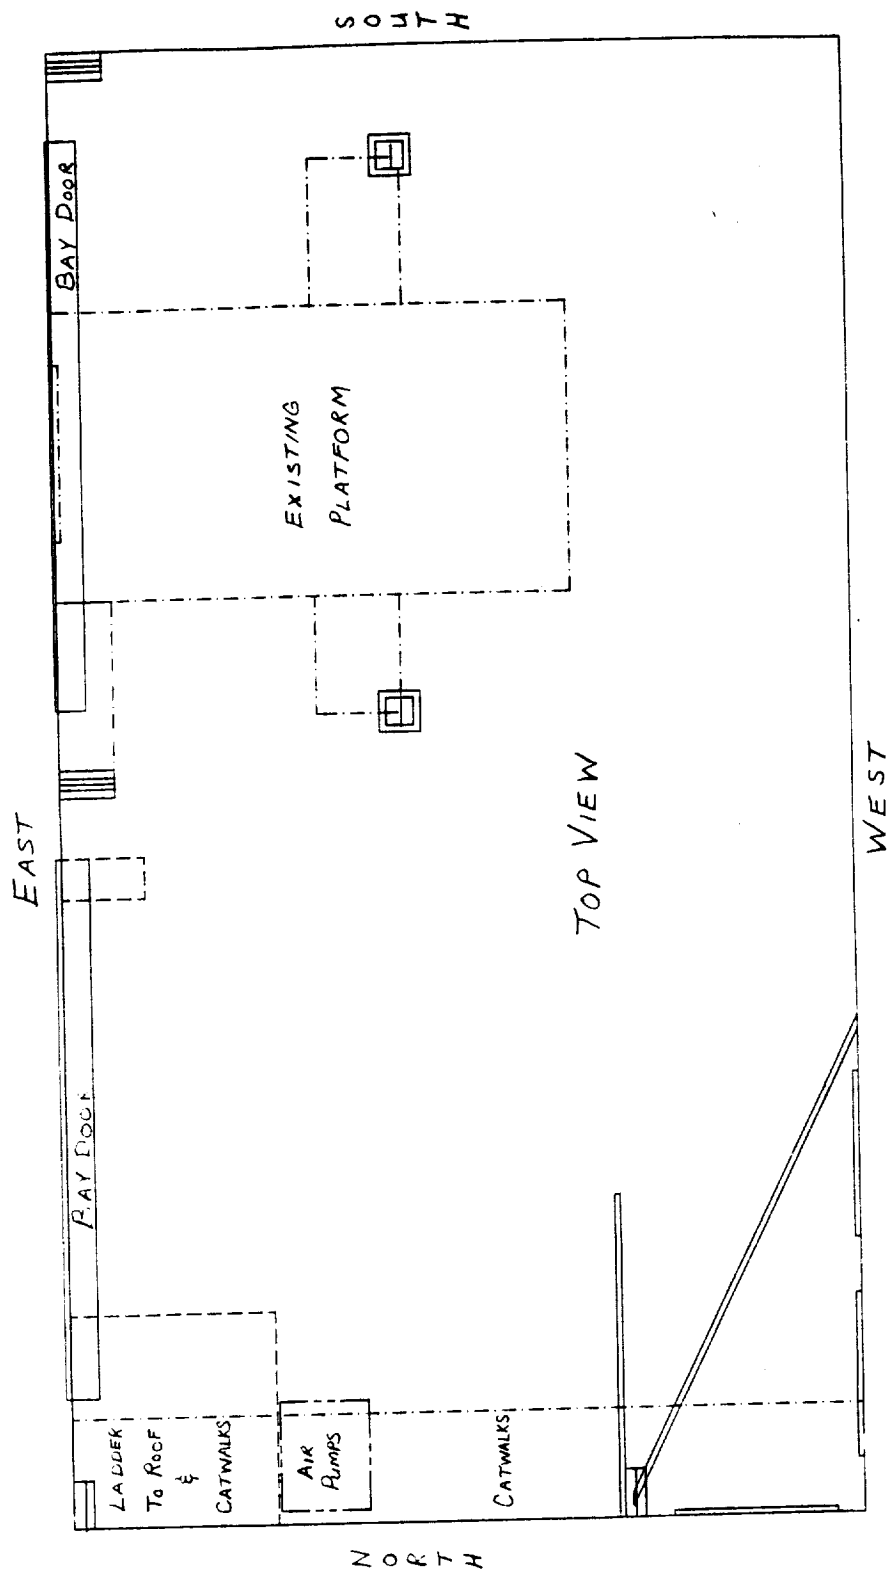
Existing Facility Floor Plan with Unused Air-Handling Units Removed
